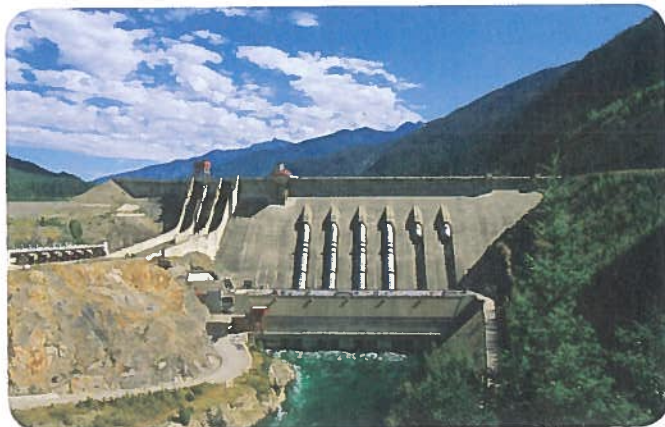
A dam is made of poured concrete, which is a mixture of sand, cement, and water that hardens to become very strong, solid concrete.
